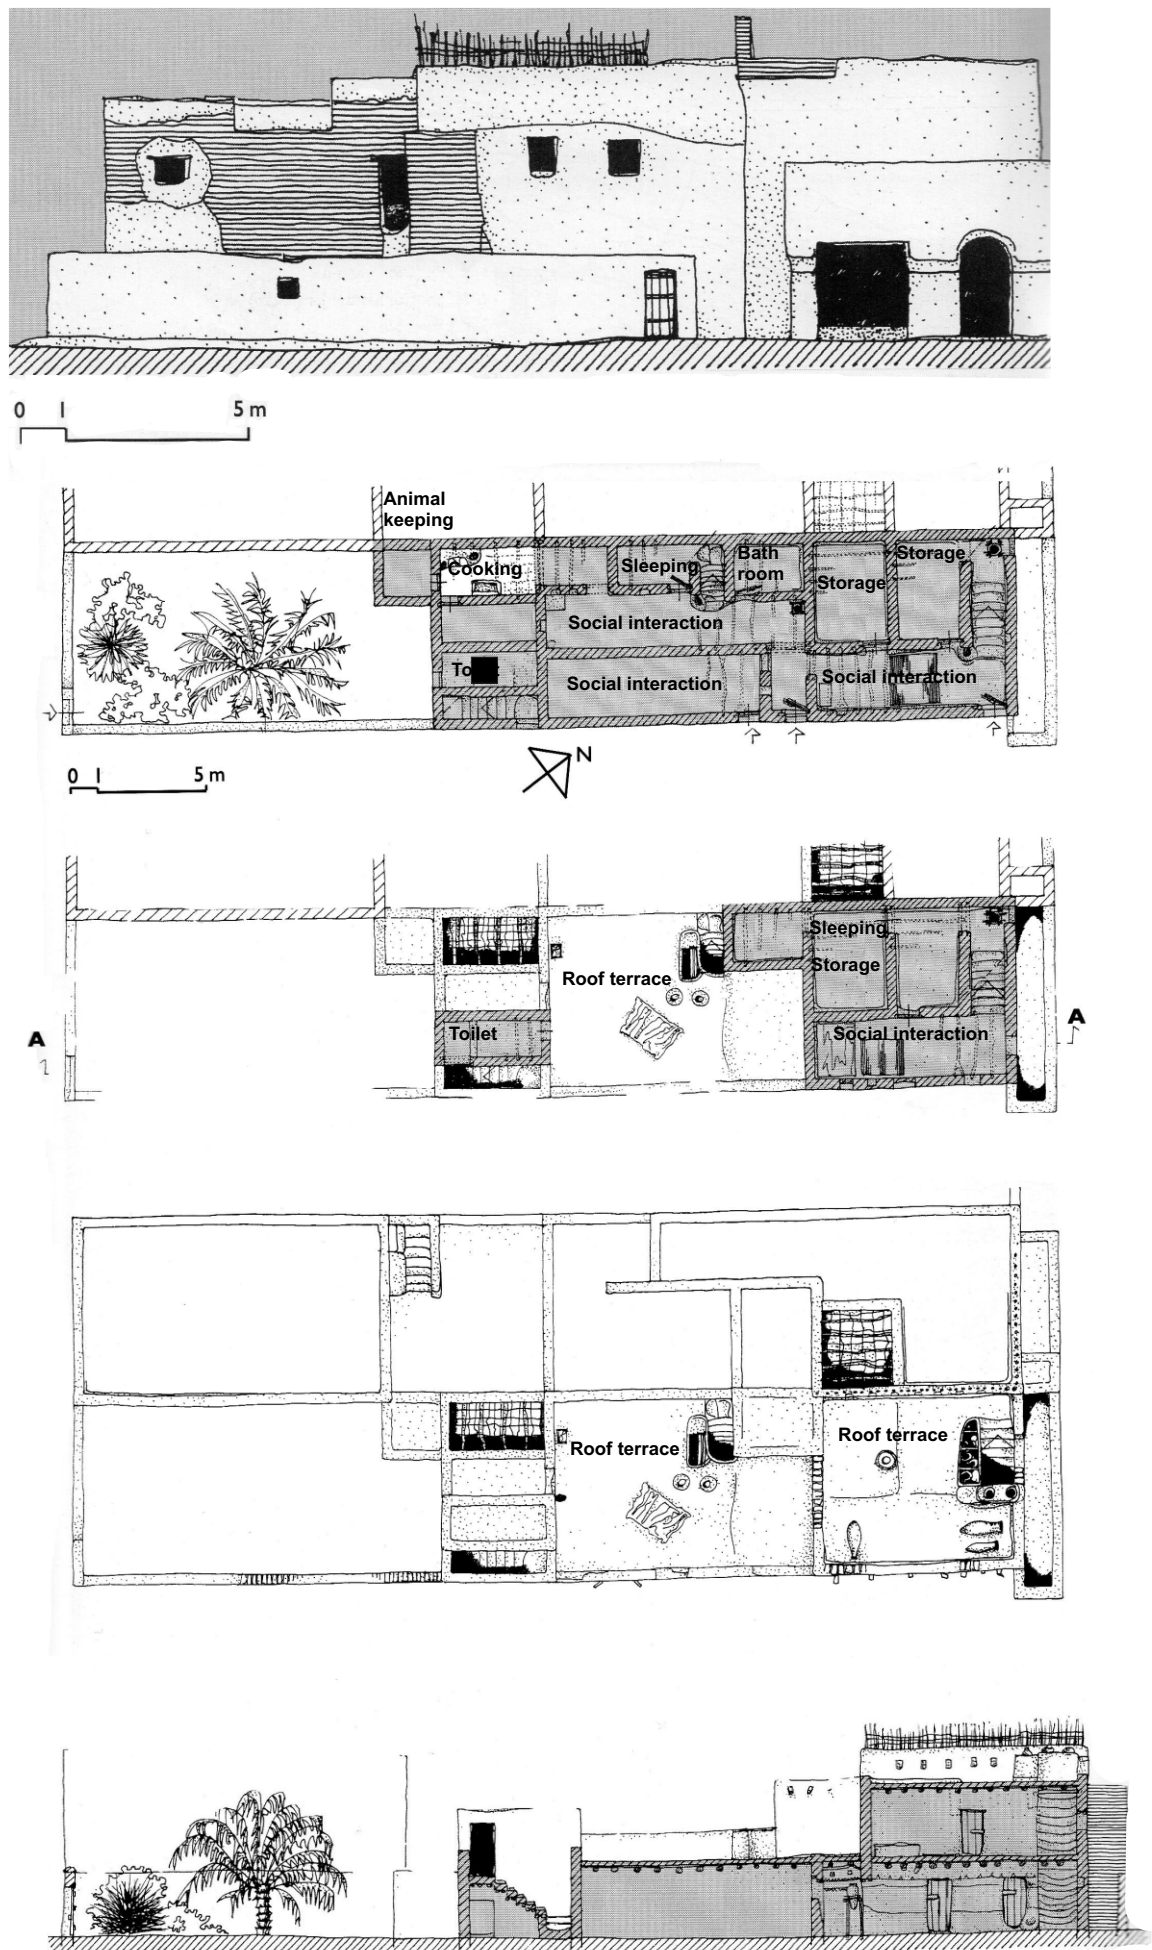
House I, Bashendi. From top to bottom: Elevation of the north facade, ground, first and roof terrace plans and section A-A (Schjins 2008, 34-36).
